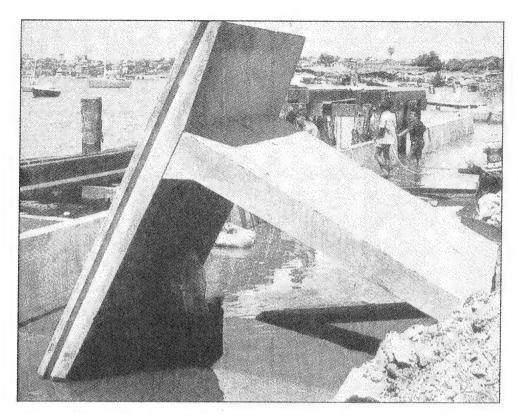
Use of form liner to create visual interest at face of panel-flood-protecting wall (from National Precast Concrete Association Australia 1991)
